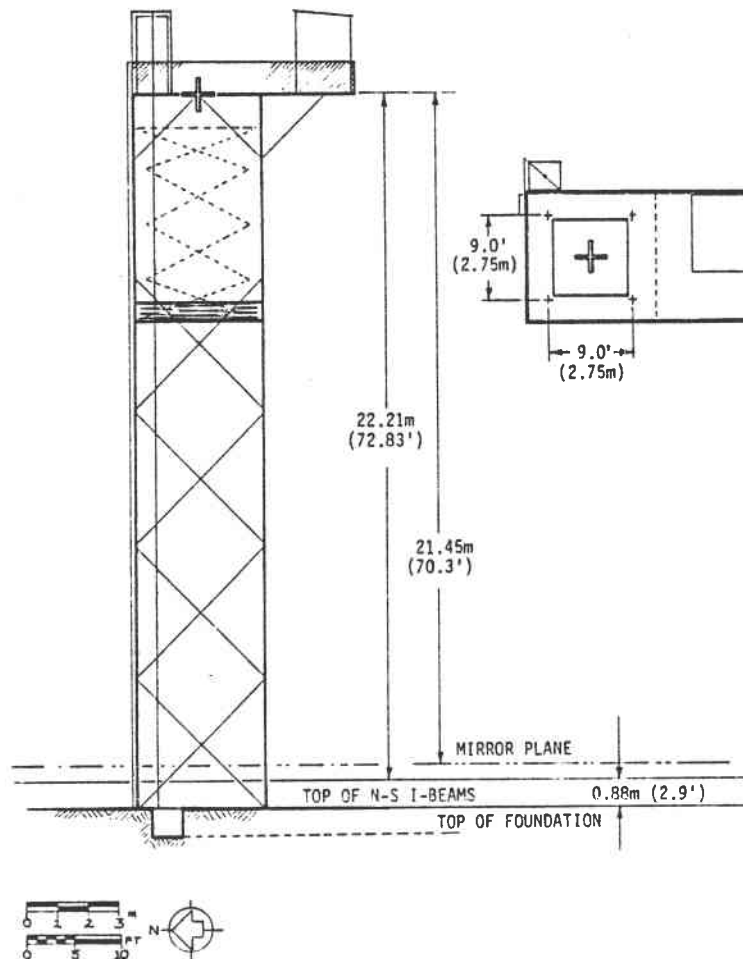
Concept Drawing of New Central Tower Showing Details of Working Level
